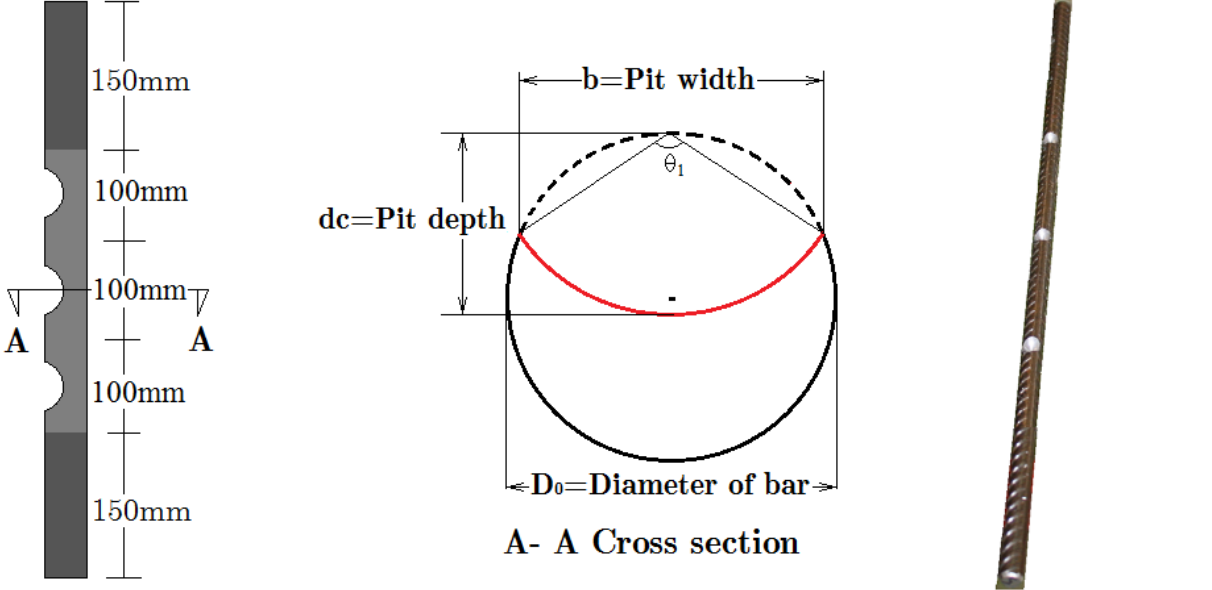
Left: geometry of pitting corrosion Middle: cross-section details of samples; Right: steel bar prepared for tensile tests (Andisheh et al, 2014)
